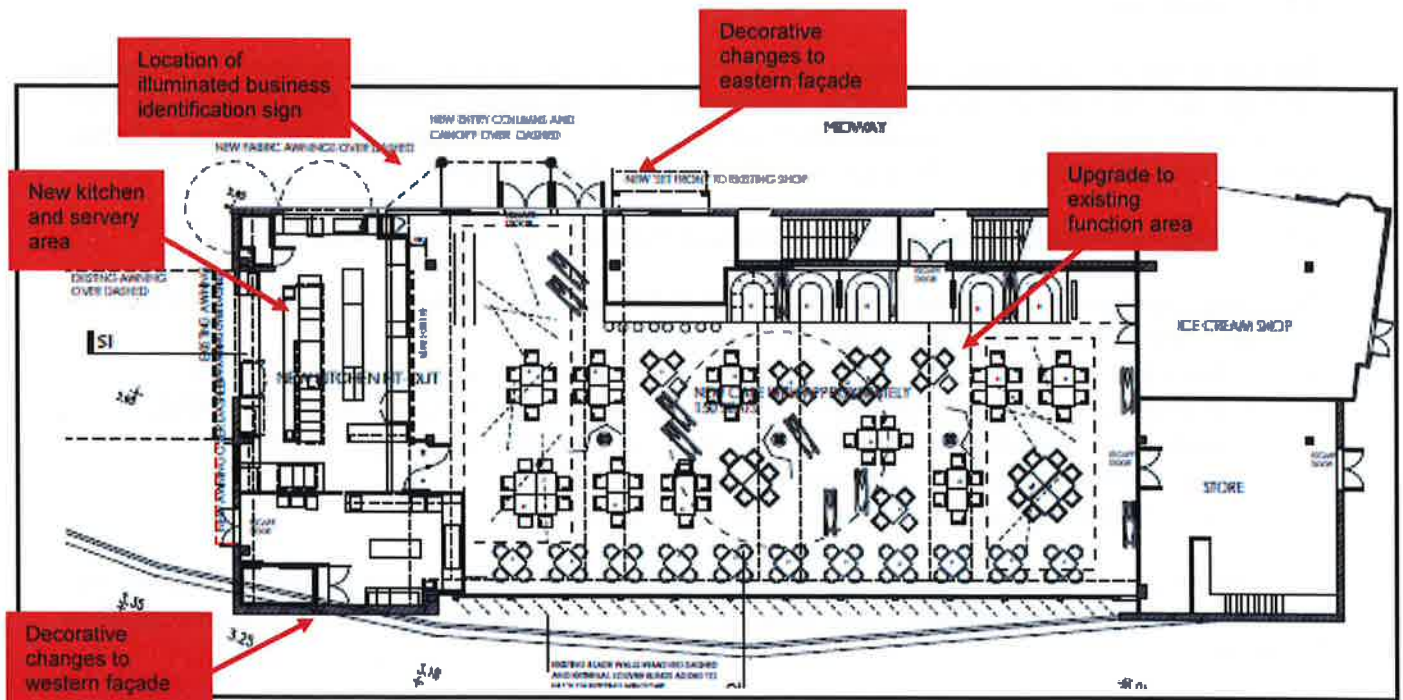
Proposed floor plan (Source: Applicant's architectural plans)
